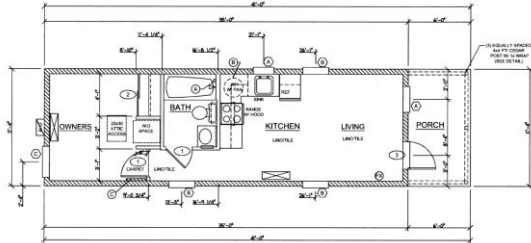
Katrina Cottage Park Model 1A Floor Plan
